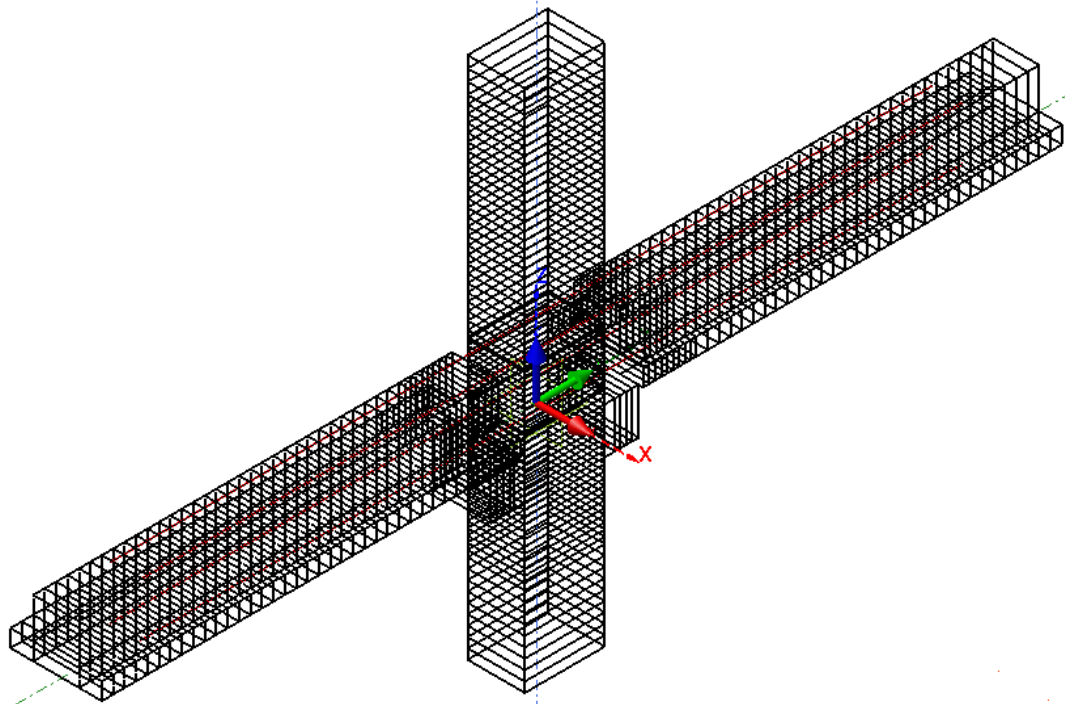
Overview of the reinforcing steel layout of 3D modeling.
